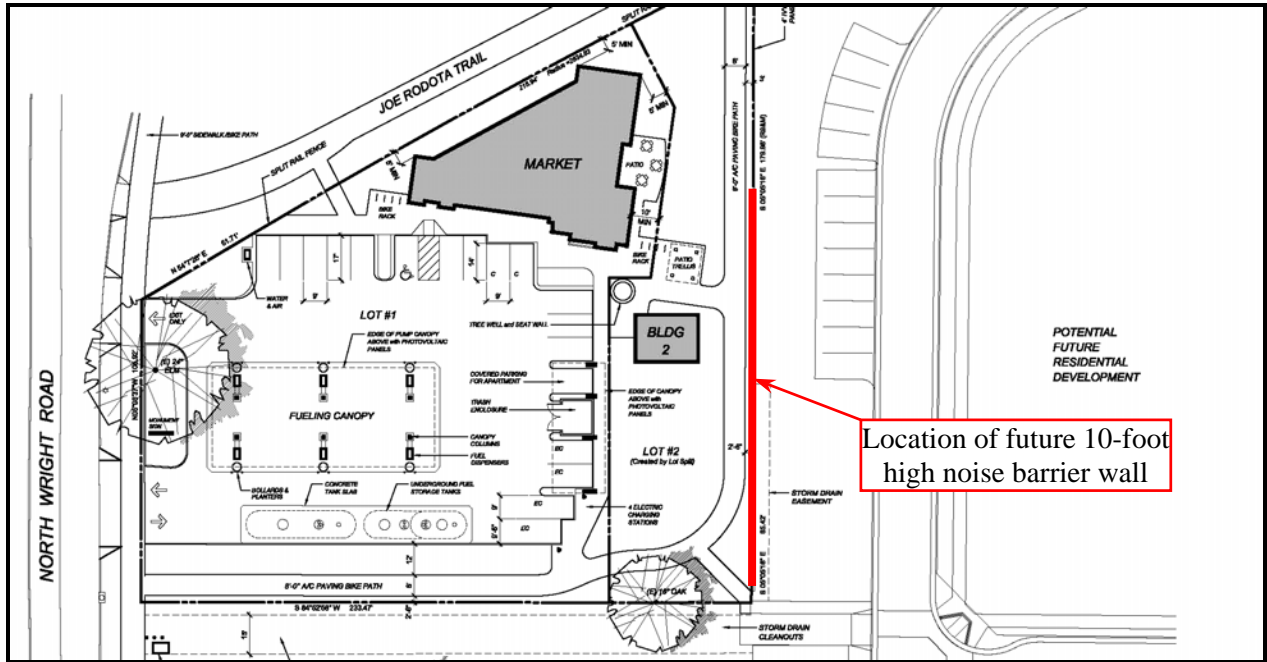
Site Plan with location of 10-foot high noise barrier wall
